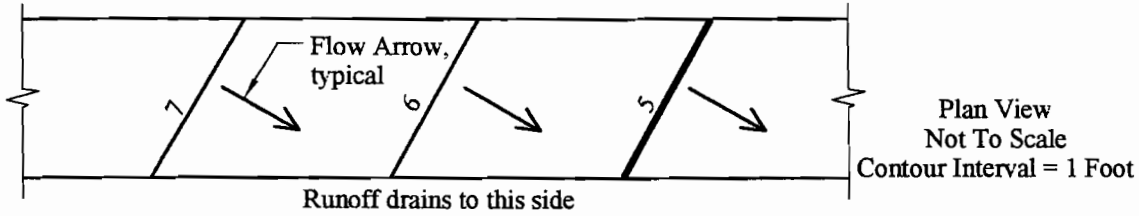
Plane Surface Having Longitudinal and Cross Slope
